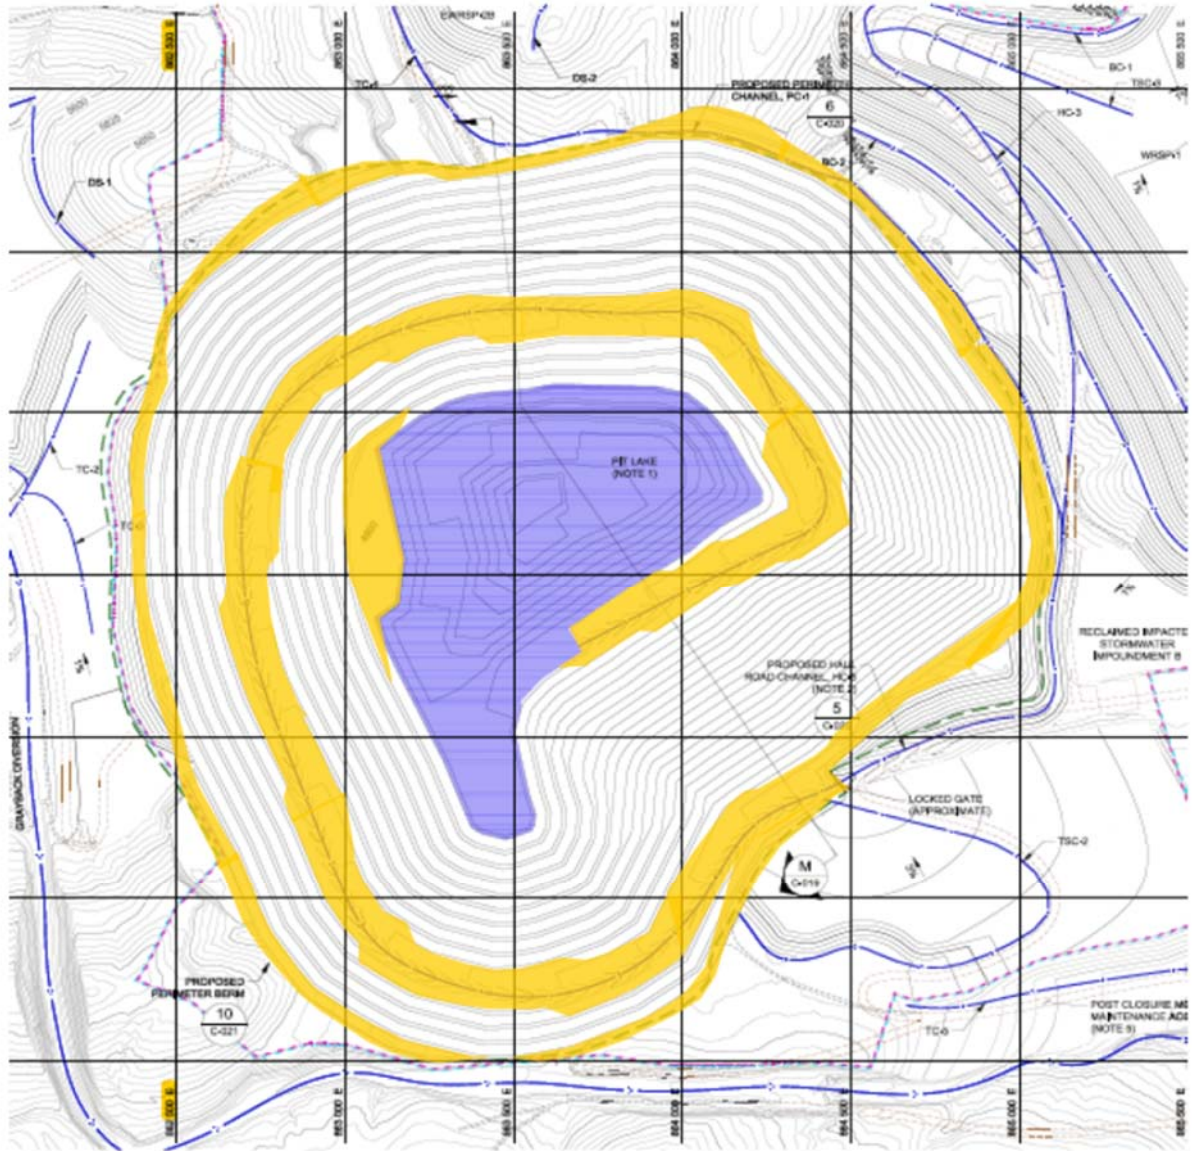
2017 MORP Pit Showing Reclaimed Pit with Pit Lake
